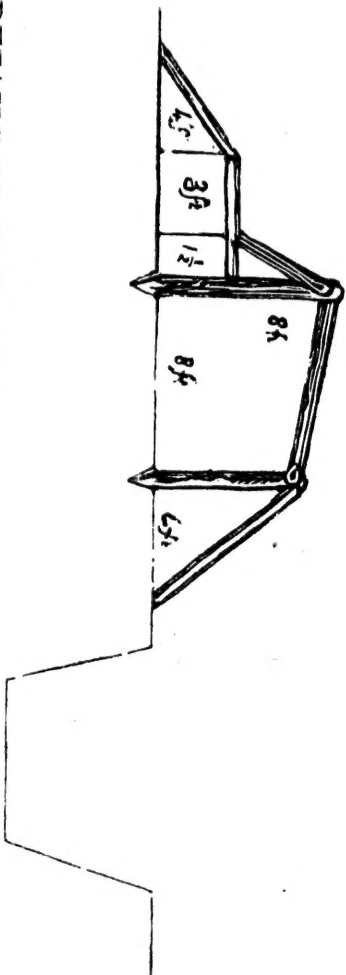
DETAILS OF CONSTRUCTION OF PARAPET.—(See page 43.)
